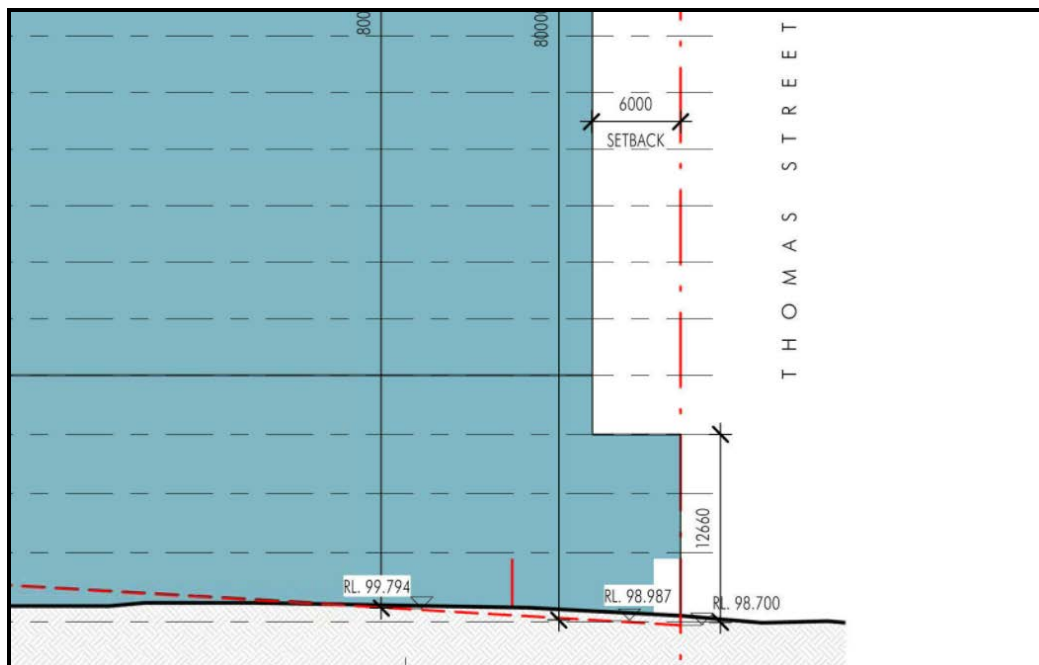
Proposed Setback from Thomas Street extract from DA plans)
